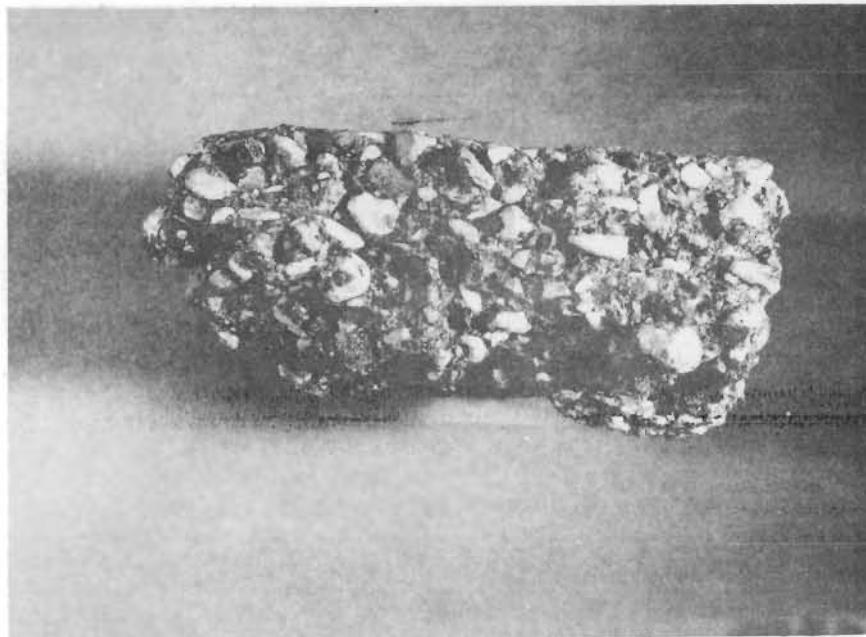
Top: Field Sample Showing Stripping in Actual Pavement.
